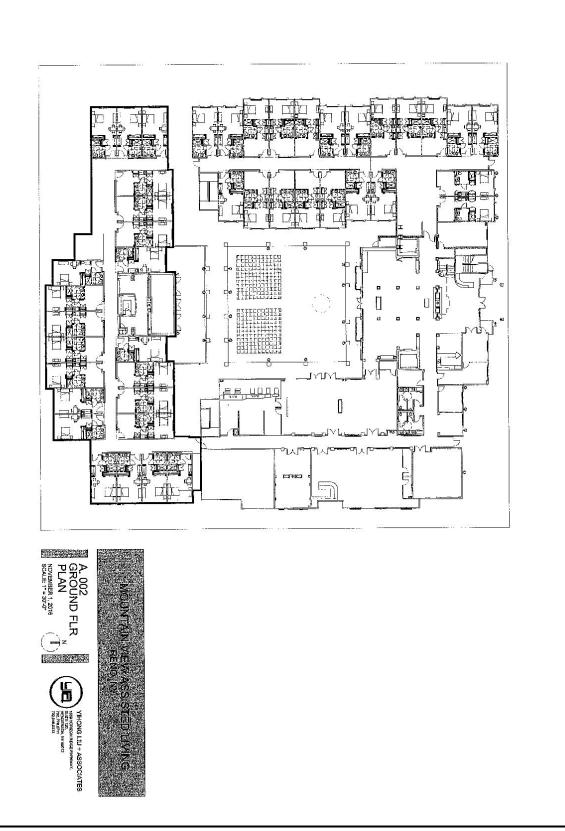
32 BED MEMORY CARE/82 BED ASSISTED LIVING GROUND FLOOR PLAN
